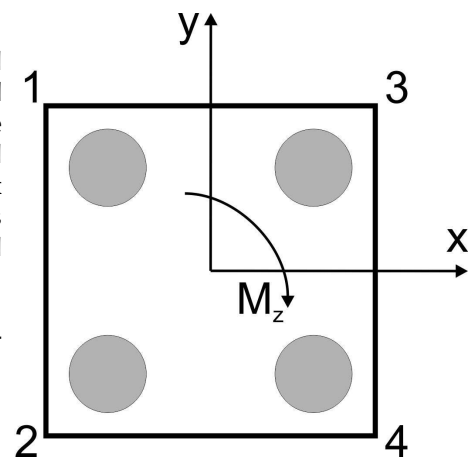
Plan view of a 2 x 2 pile group in the XY plane
